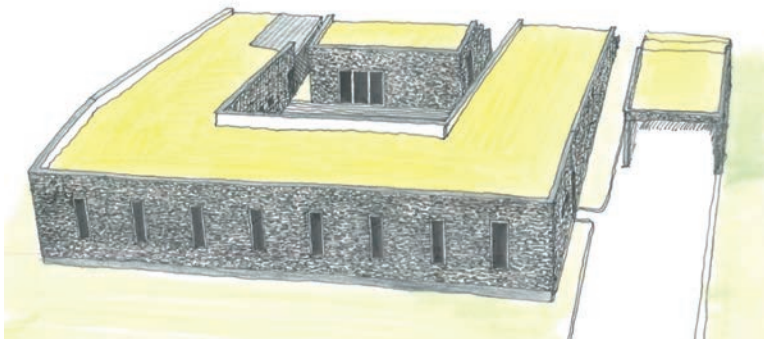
Design of the proposed building. Design and drawing: M. Nedvěď
